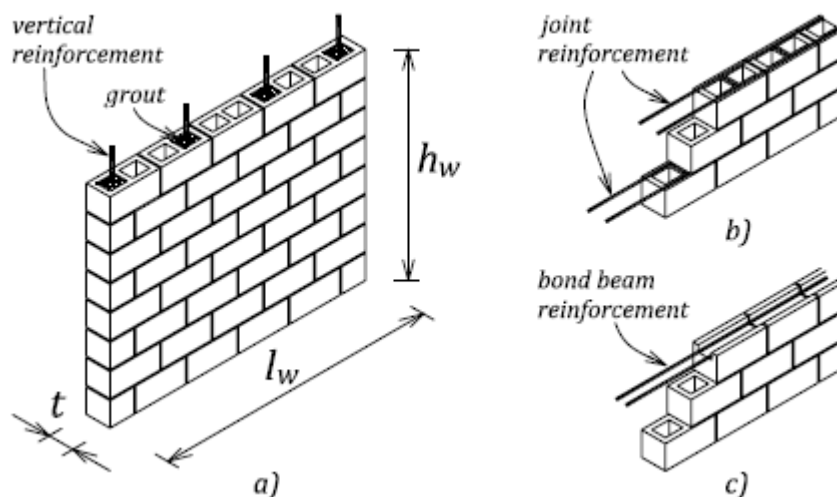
Typical reinforced concrete masonry block wall: a) vertical reinforcement; b) joint reinforcement; c) bond beam reinforcement.
